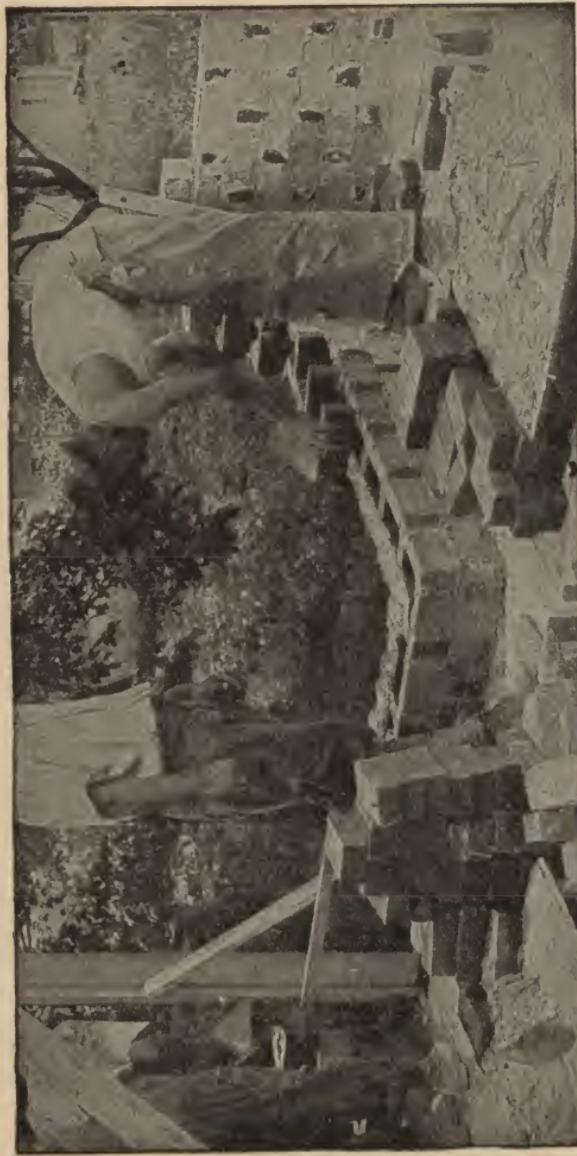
,125.—Bricklayer laying hollow wall in single Flemish bond with brick on edge.
